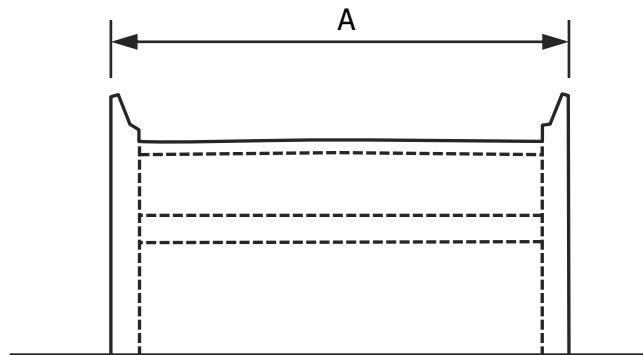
Cross-section view of a filled arch bridge under fill, or culvert, ~~under fill~~ with headwalls.
